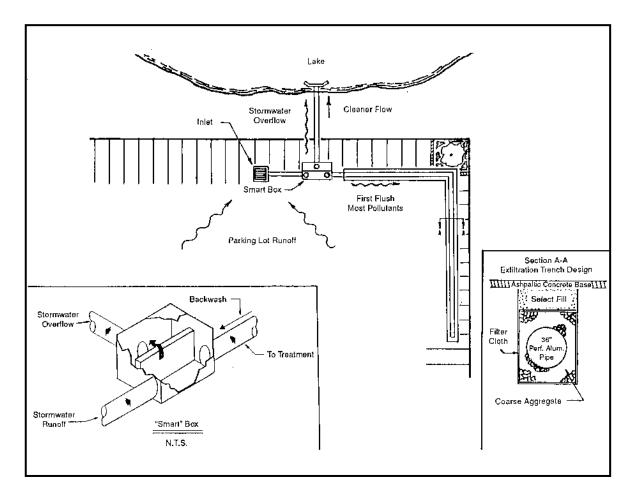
Cross-Section of Typical Infiltration/Exfiltration System for Parking or Roads
